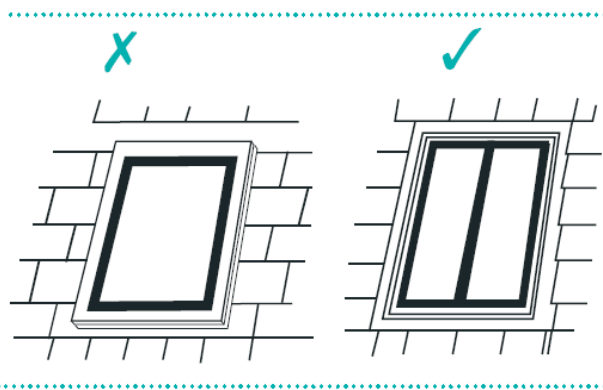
Flush fitting ‘conservation’ style rooflights sit more comfortably within roof slopes
